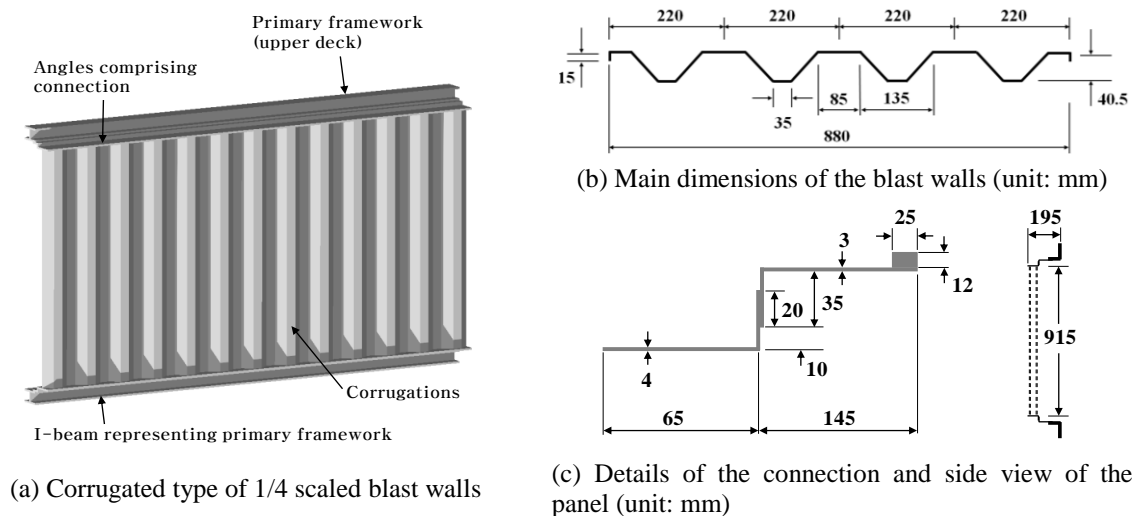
1/4 scaled blast walls and profile dimension (HSE 2003)
